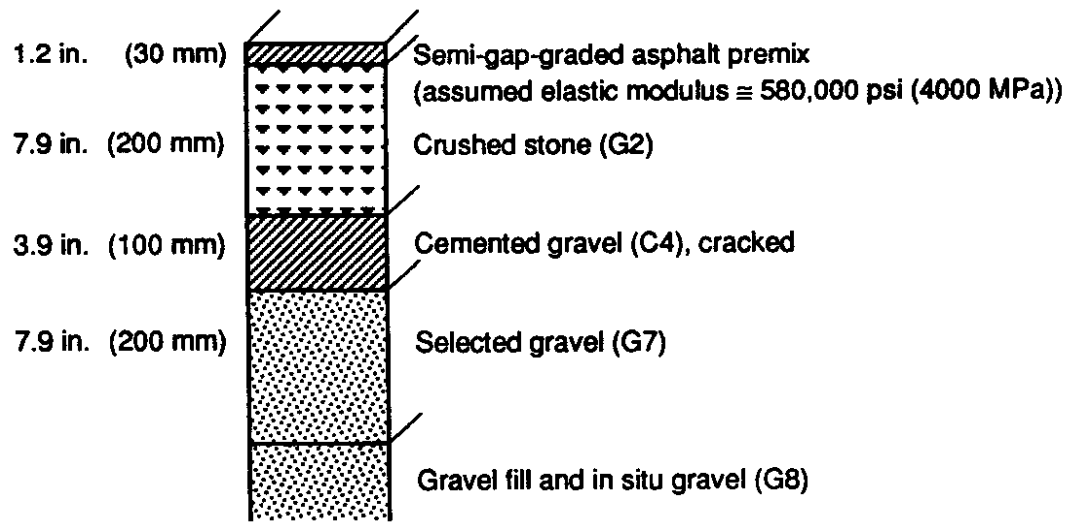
The Light Pavements, Road P 6/1 and Road P 123/1, Tested by the Heavy Vehicle Simulator (4)
